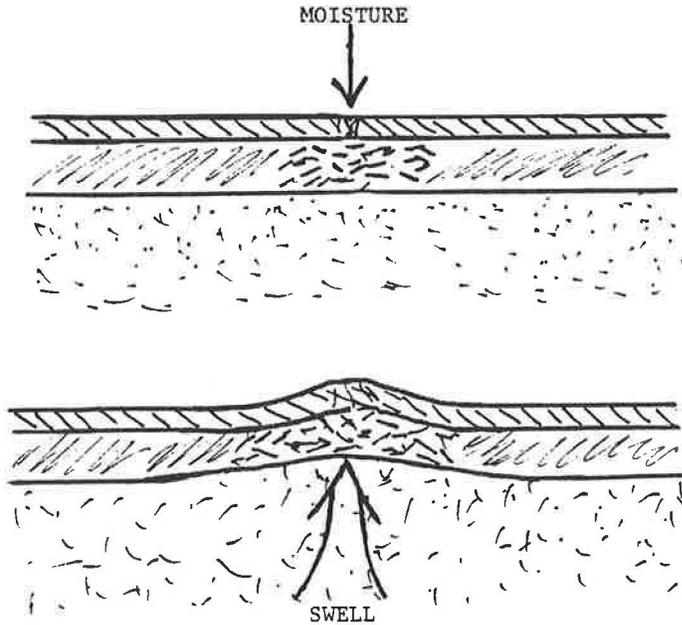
(top) Construction fracturing; (bottom) subgrade swelling damage.
